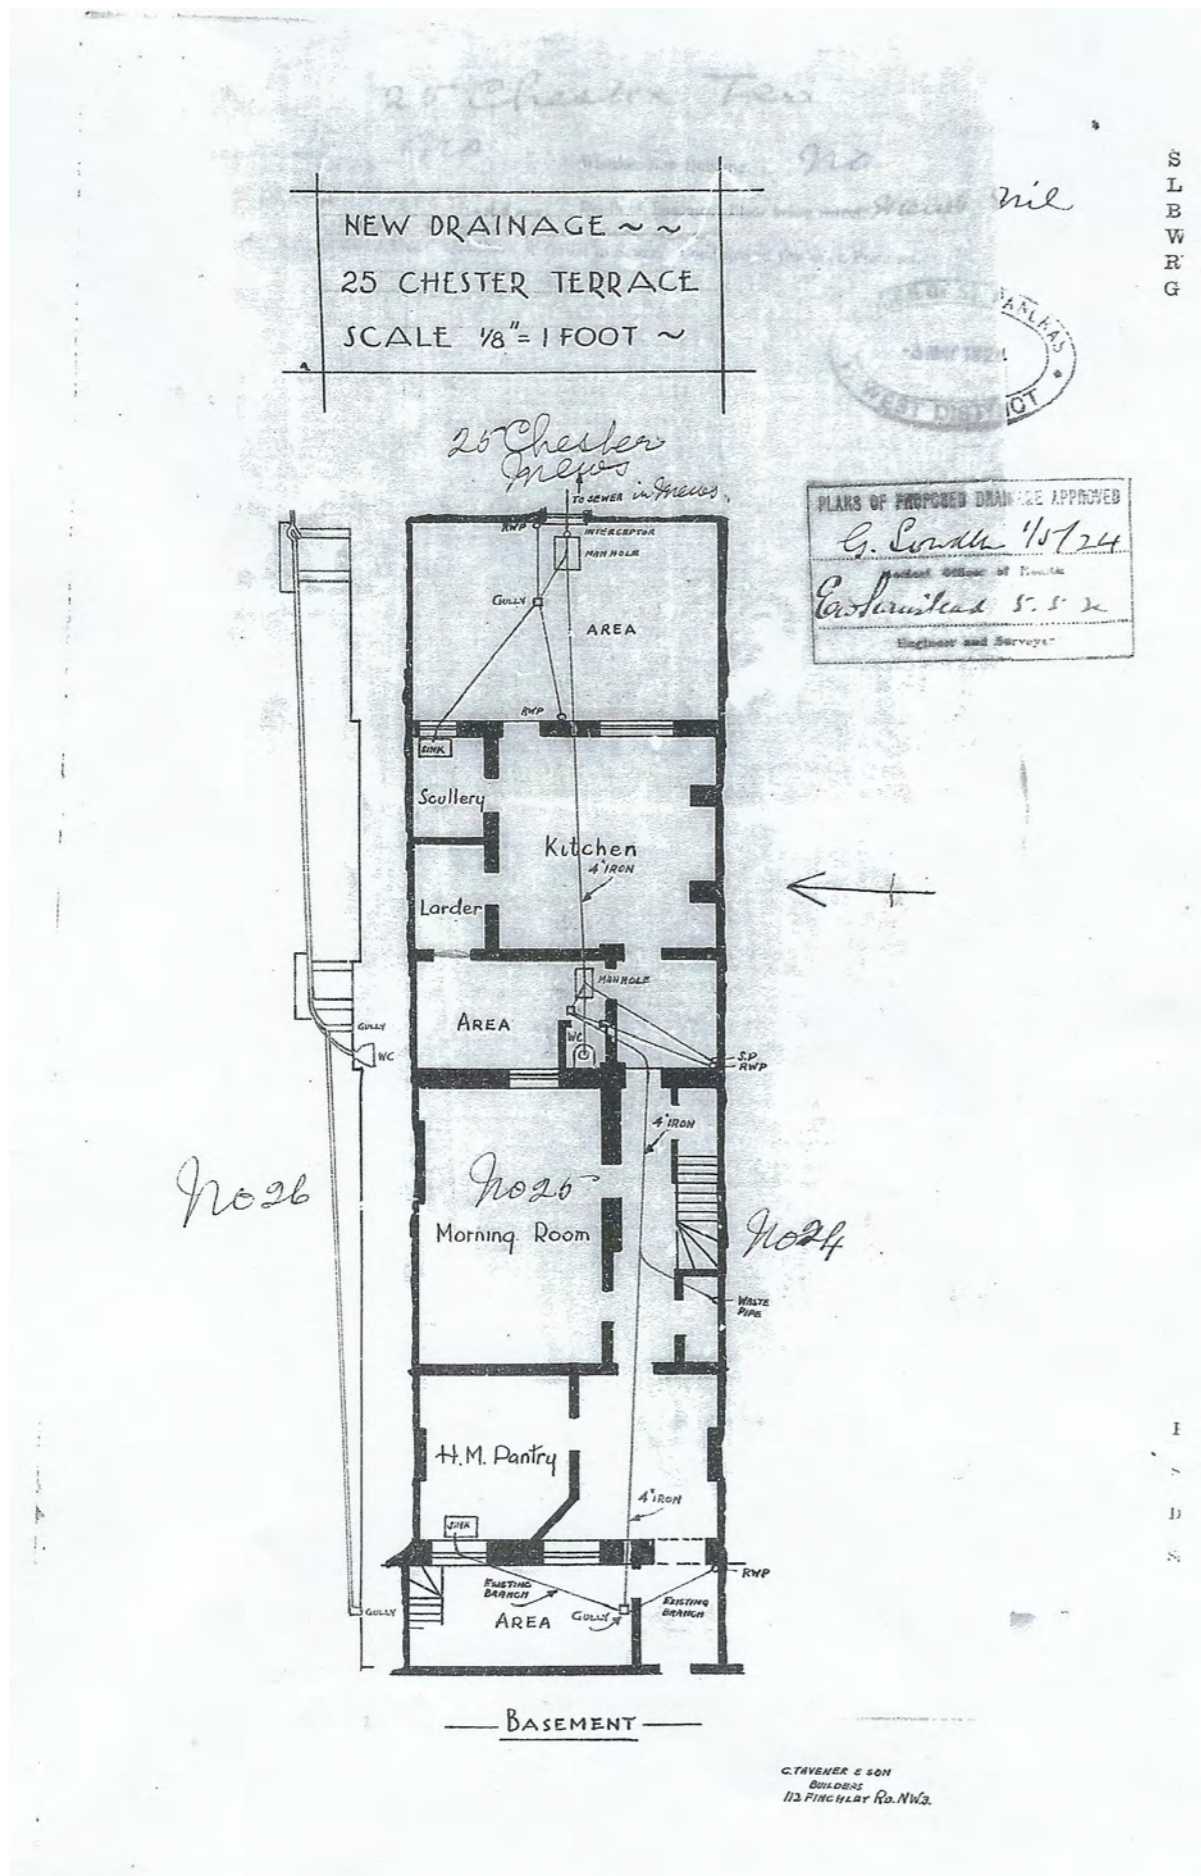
1924 Drainage Plan of No. 25 Chester Terrace
